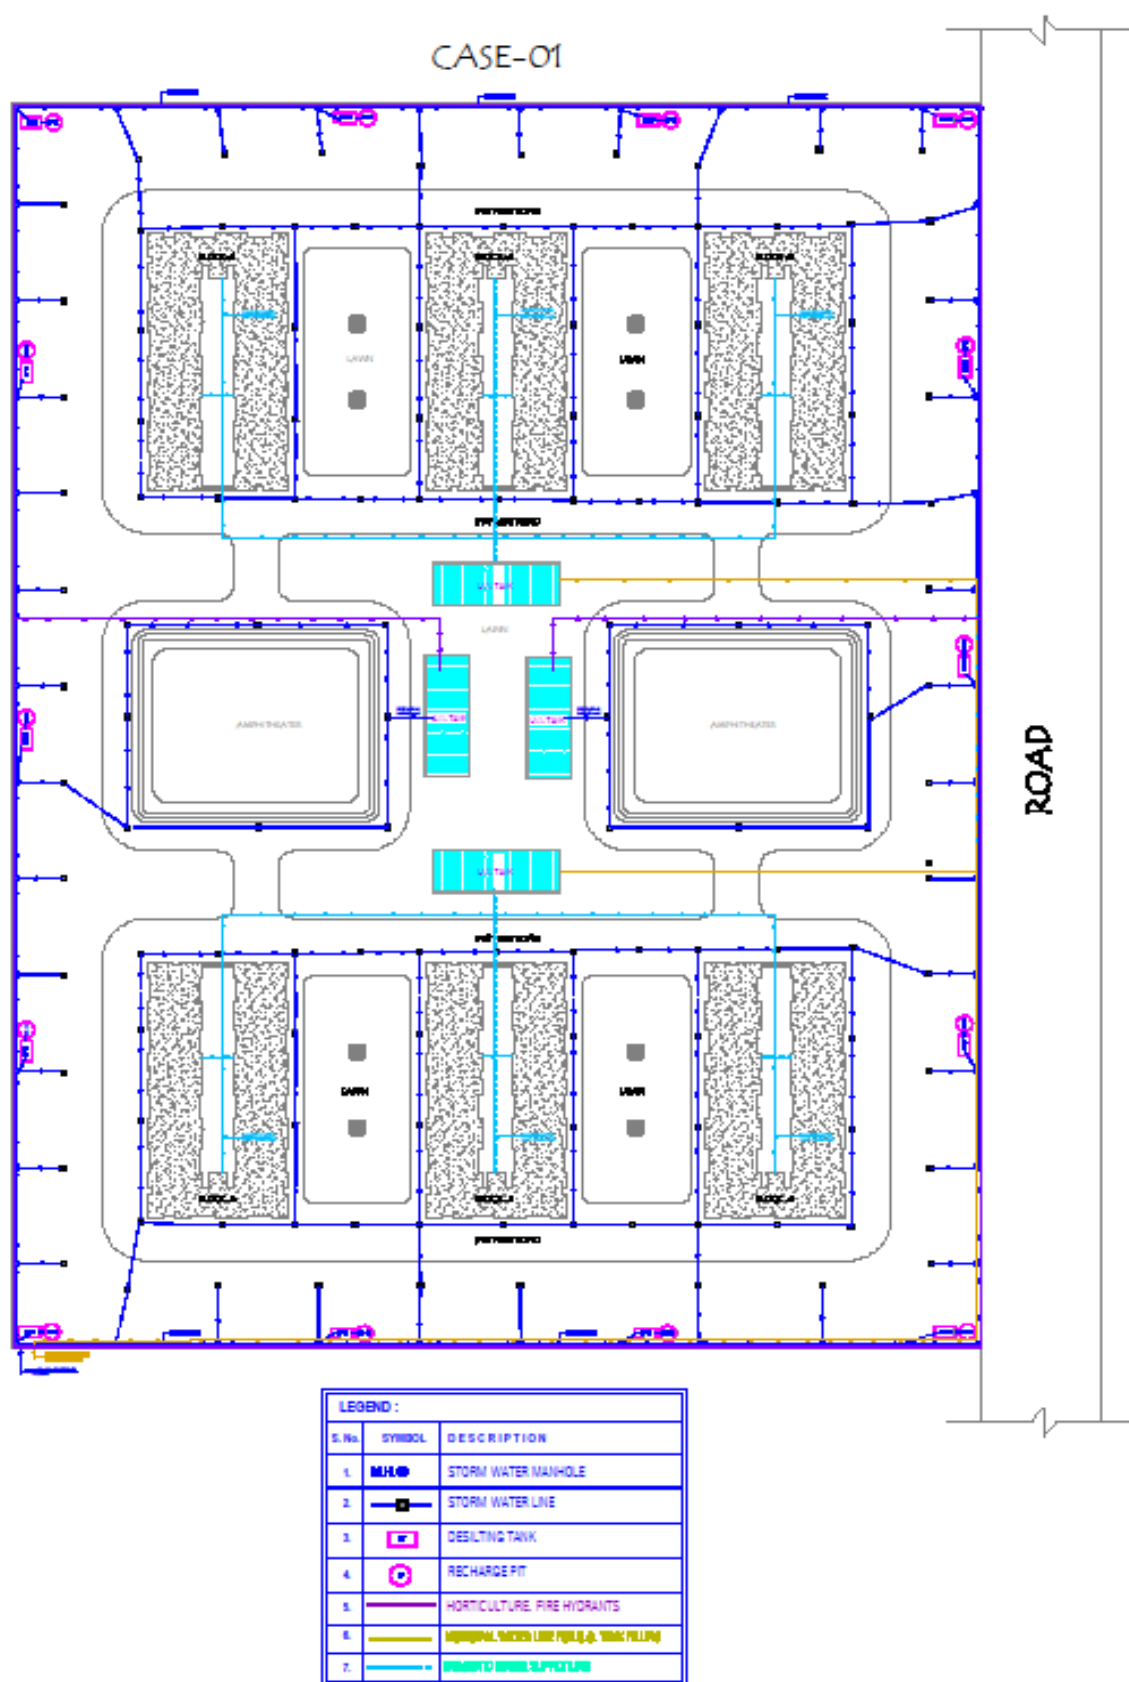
Proposed design case for rainwater harvesting (Author, 2021)
